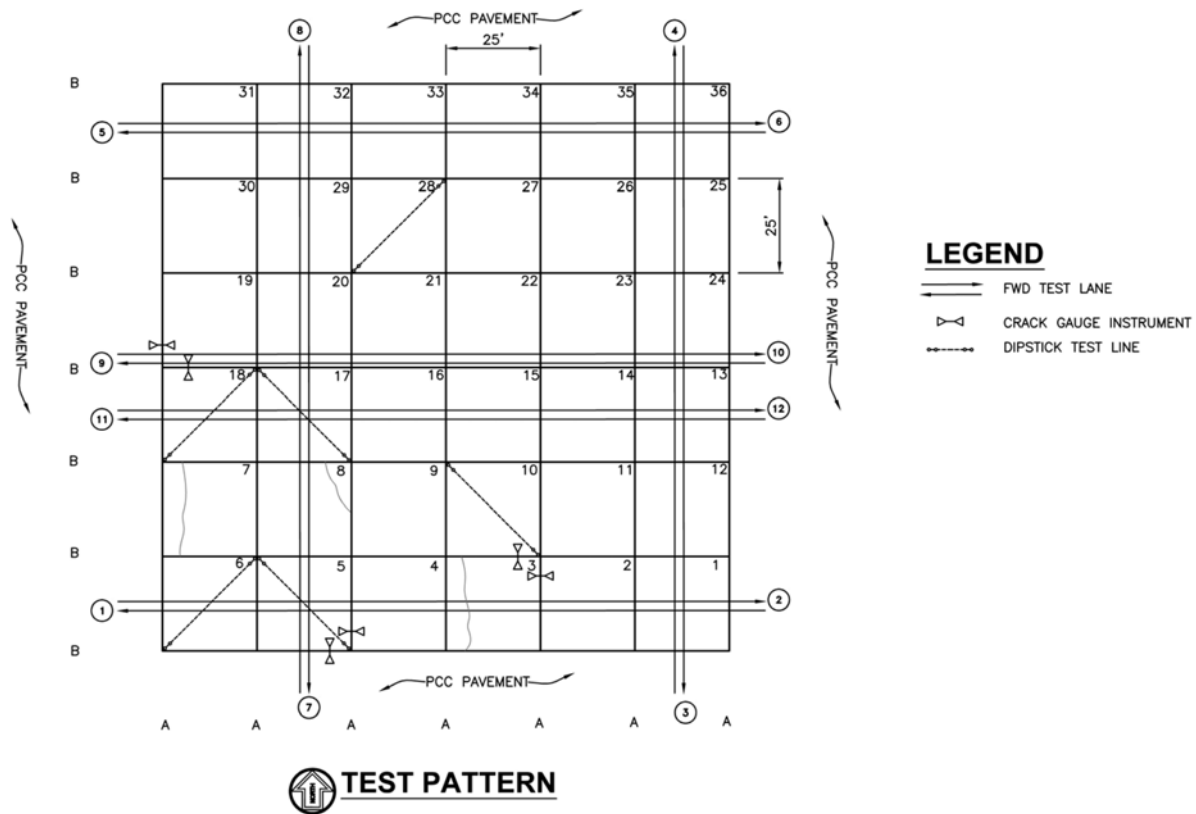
A TYPICAL TEST SITE LAYOUT DIAGRAM, FROM TEST SITE 4-AC18
